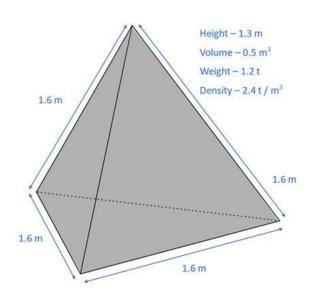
Parameters of concrete tetrahedrons used as "dragon's teeth" obstacles¹³⁷
